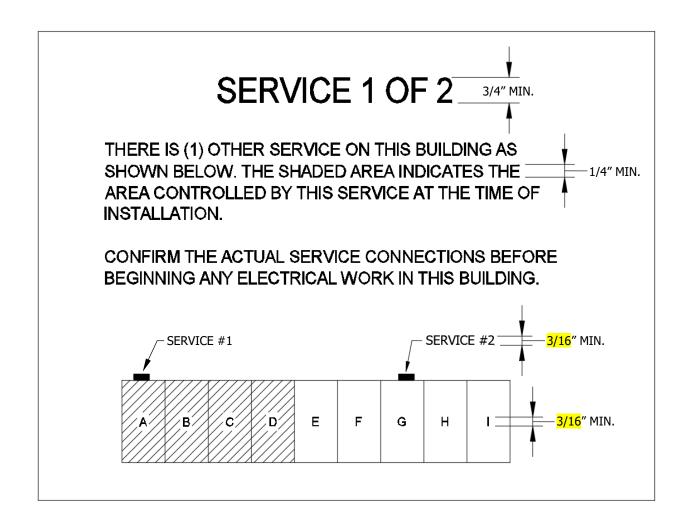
TYPICAL PLAQUE FOR NEW BUILDINGS OR EXISTING BUILDINGS (V) WITH SEPARATE SERVICE AREAS
